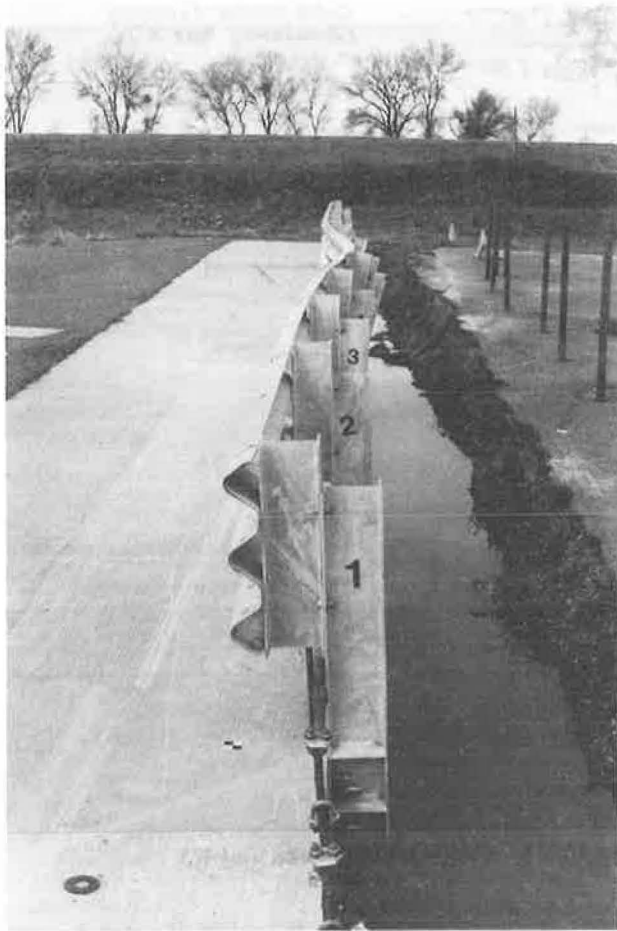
Rail damage: bent rail, bent posts, Test 473.
